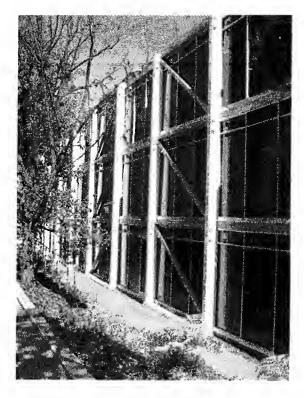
701 Welch Road, Windows extended to eaves, Building A
